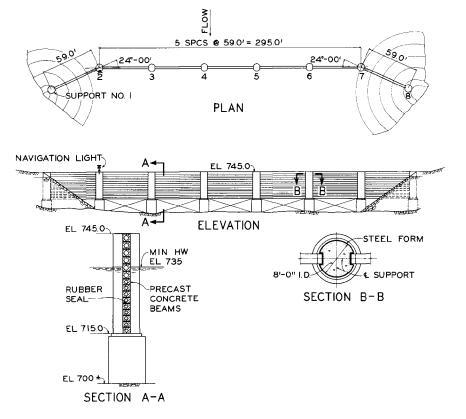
Plan and elevation of skimmer wall; see figure 144.
